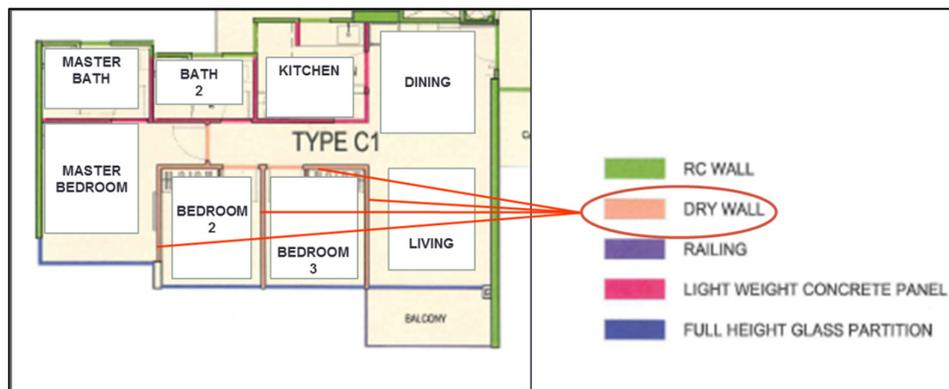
Example of a layout showing the mandatory use of drywall for all internal dry areas.
